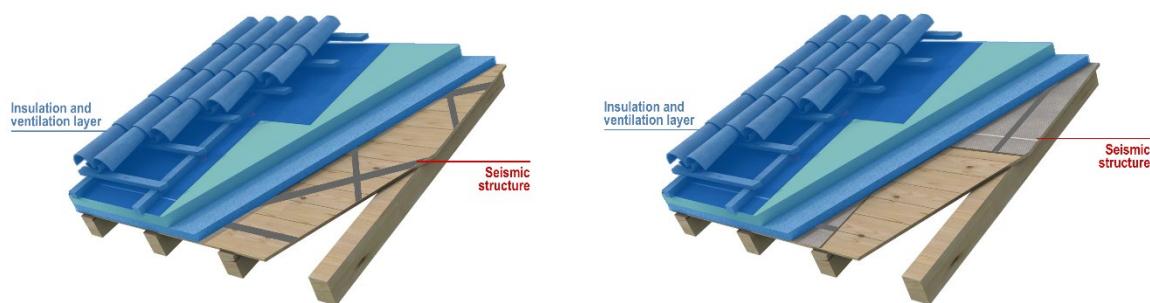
Nested building approach – detail of floor and roof improvements through CLT panels and thermal insulation.
